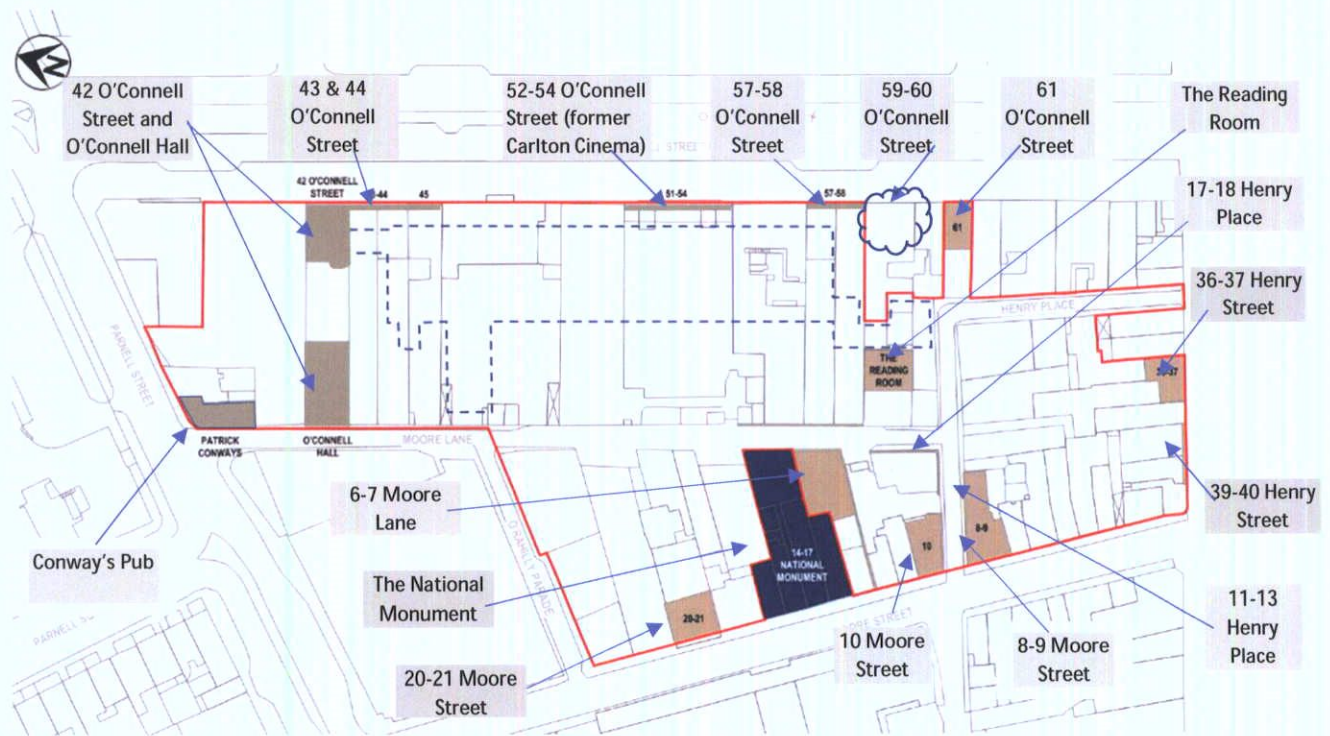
Protected Structures and non-protected structures proposed to be retained.
